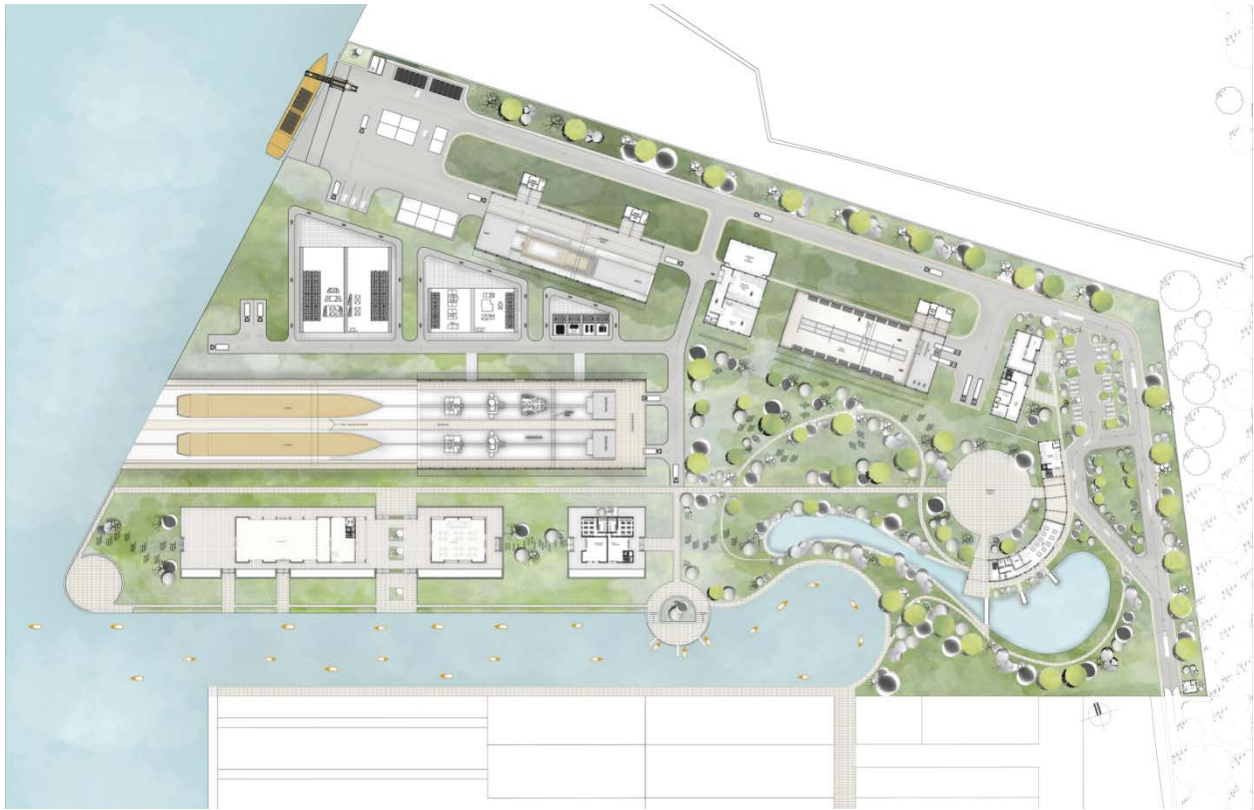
Masterplan showing Groundfloor Plan (Source: Author)
